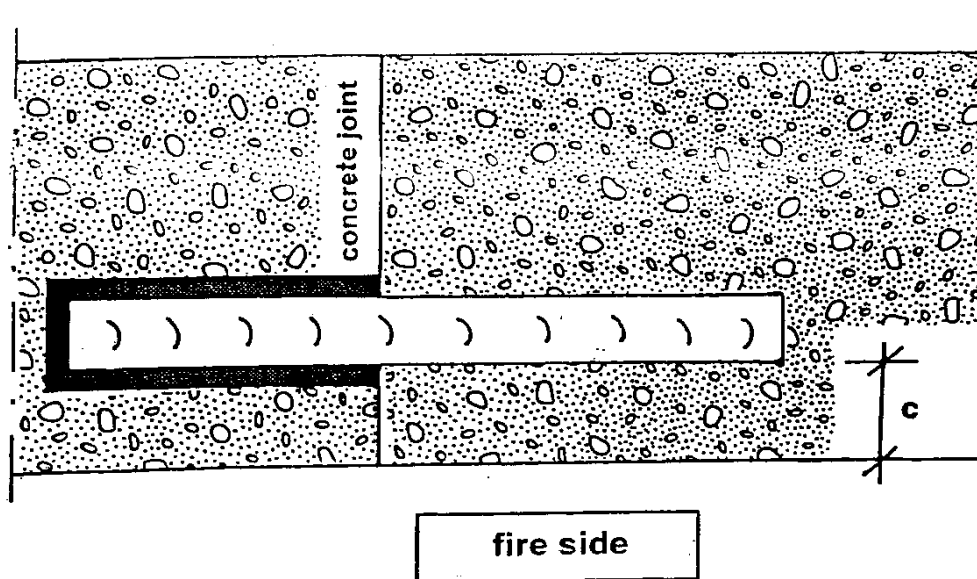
Schematic depiction of rebar connection version "ANCHORED REBAR"
